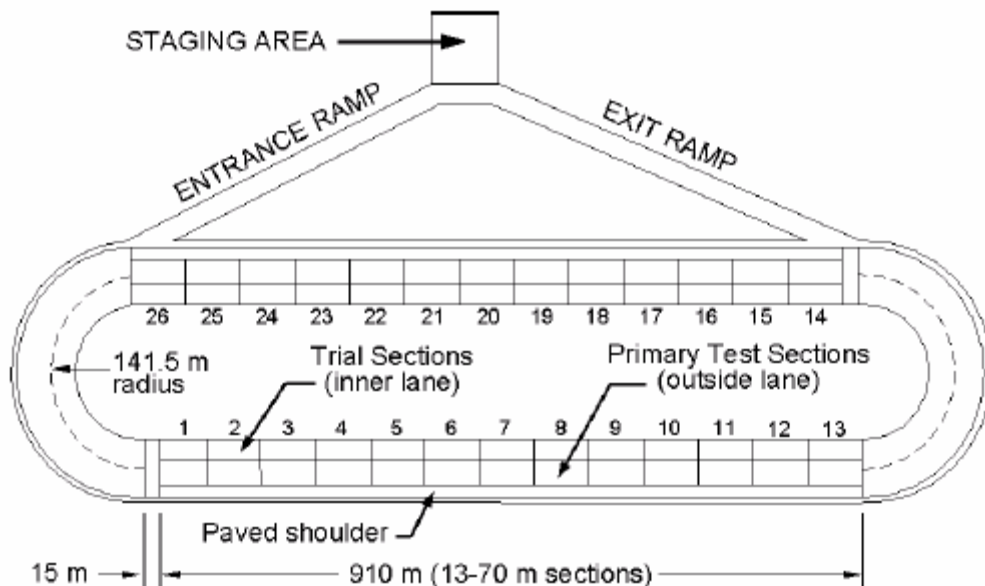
WesTrack - Layout of Test Track (not to scale)
